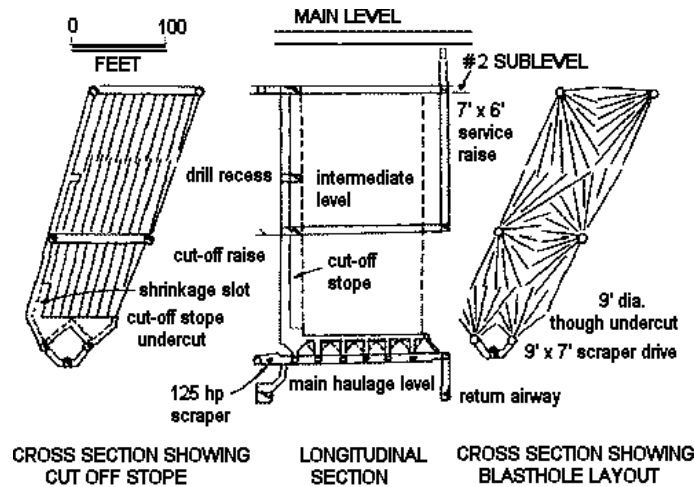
Diagrammic Layout of typical sublevel open stope
